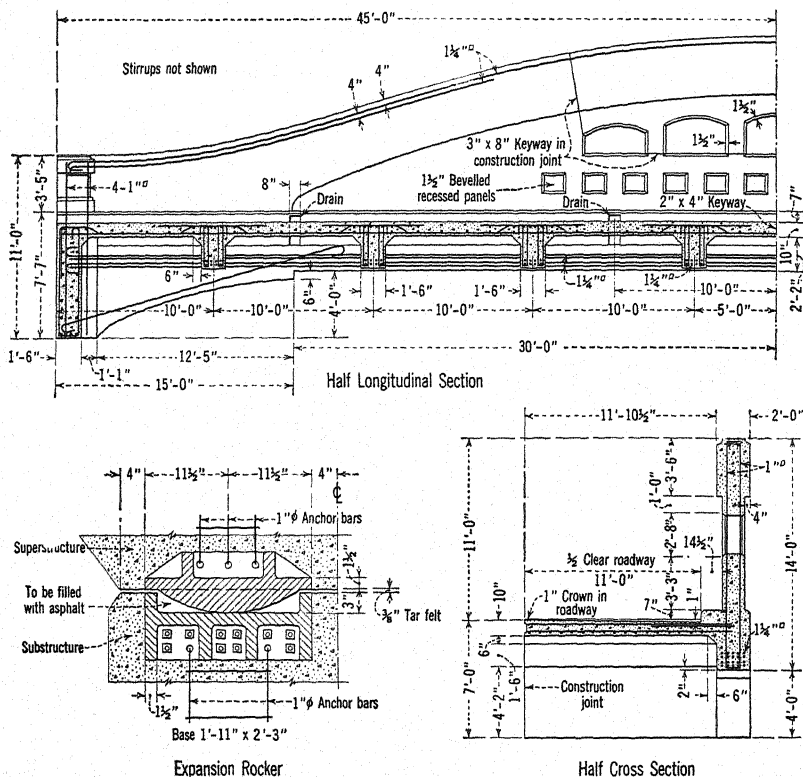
Through Girder Bridge. Kalamazoo, Michigan. (See p. 117.)
